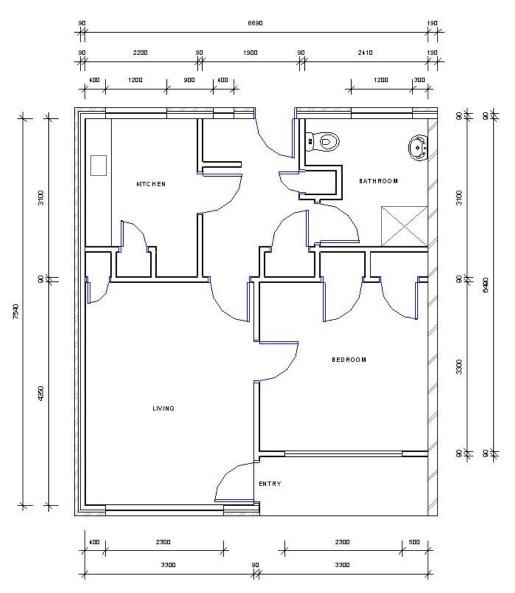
Typical partial floor plan of residential unit (Blocks A – C).
